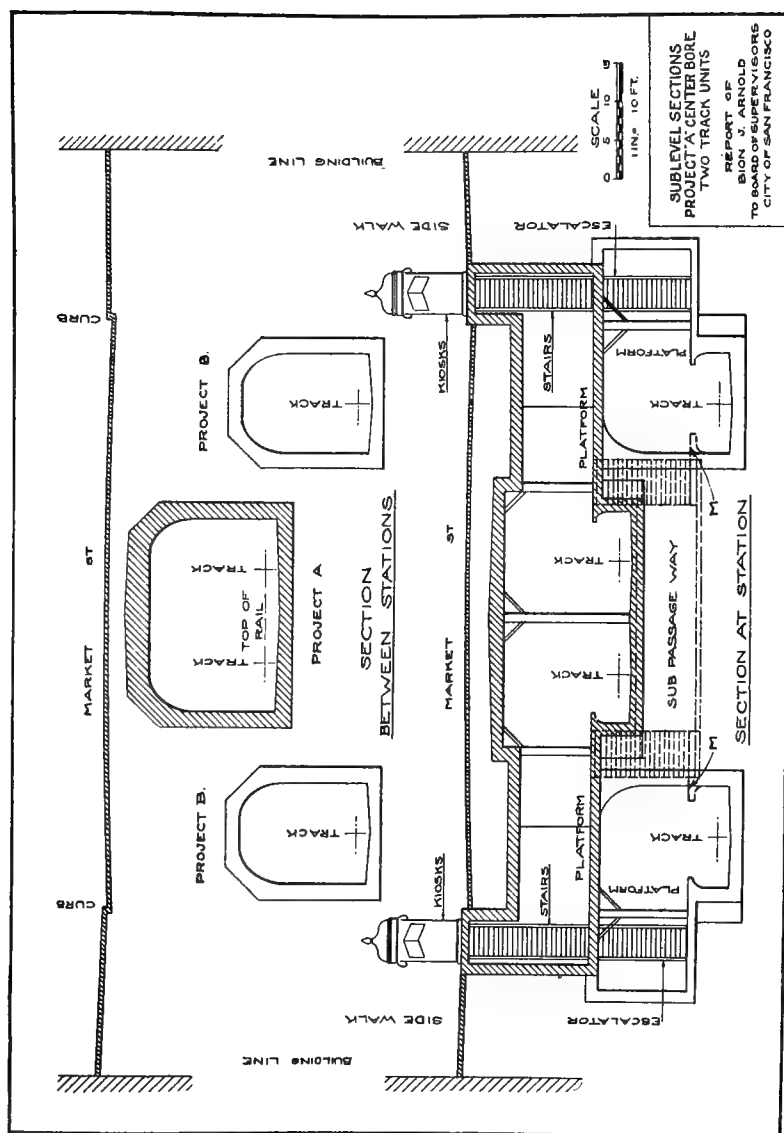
INDEPENDENT SUB-LEVEL SUBWAY SECTION
